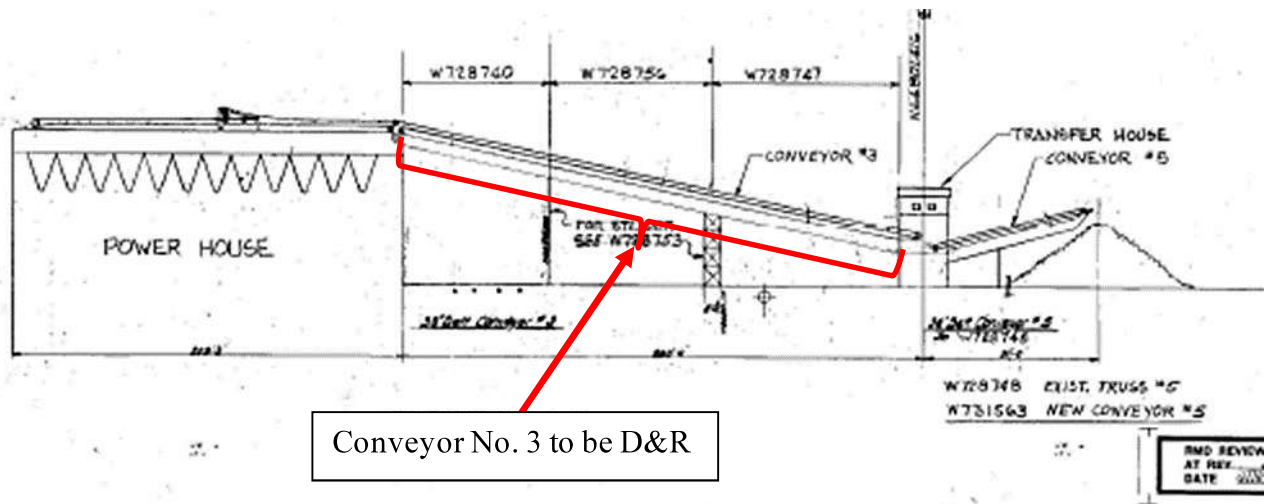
Conveyor No. 3 Elevation View (Looking East)
